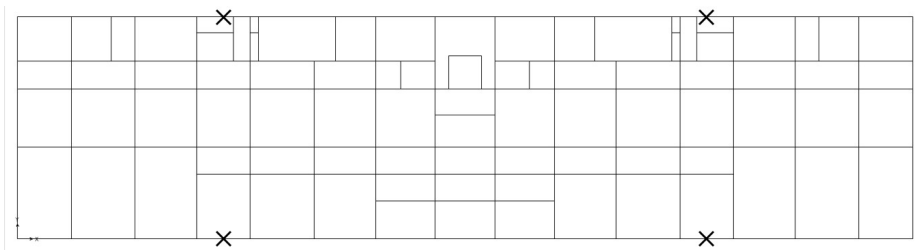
Damper Placement at 4th floor (SR-X); ODAM: 4 dampers
